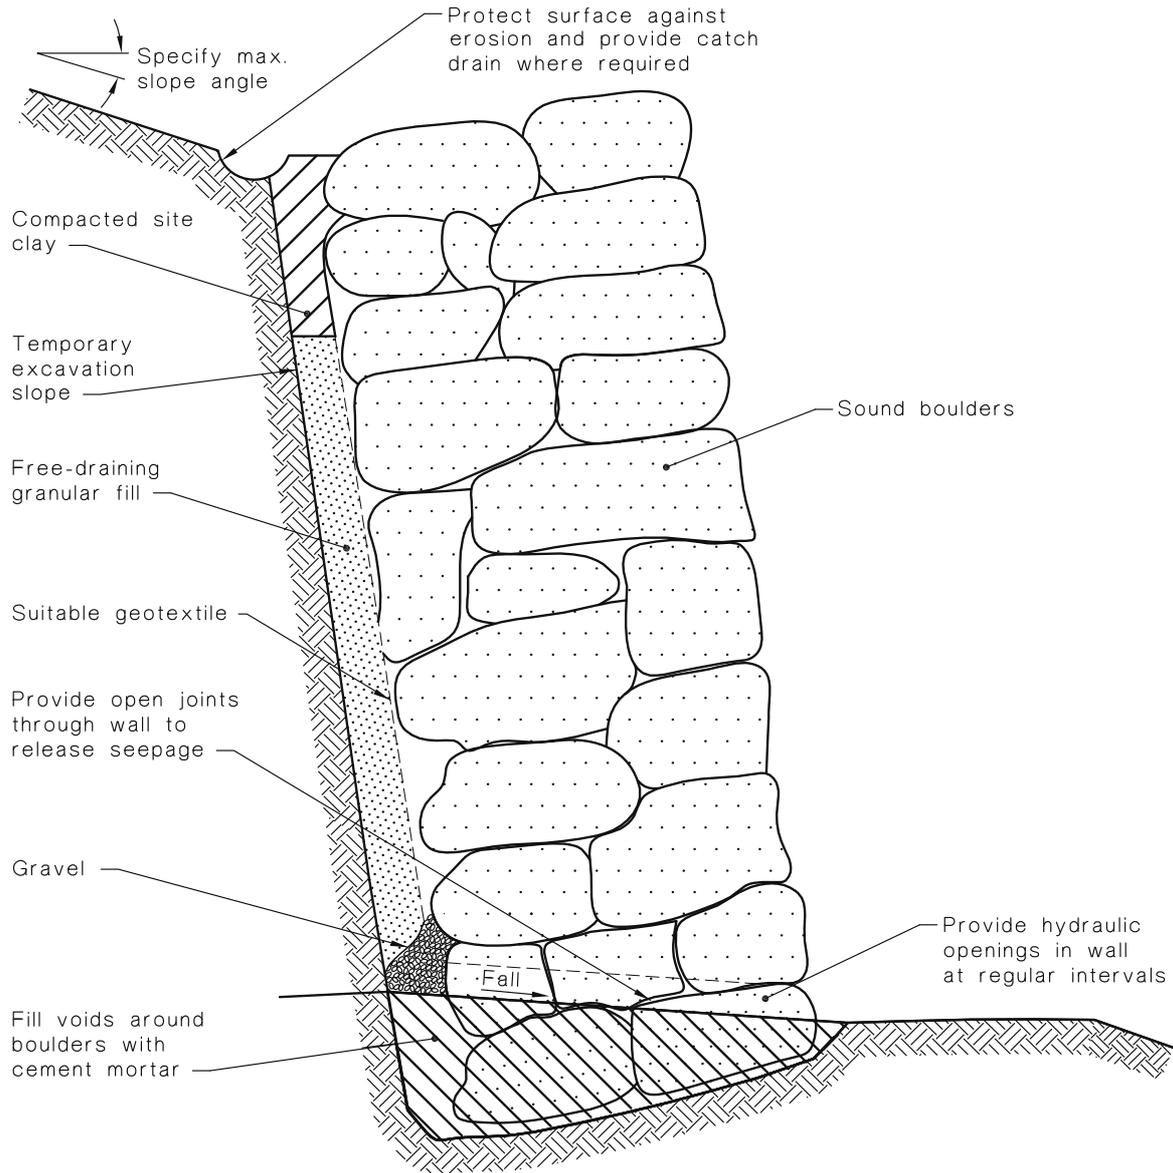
TYPICAL SECTION—GRAVITY BOULDER WALL DRAINAGE
